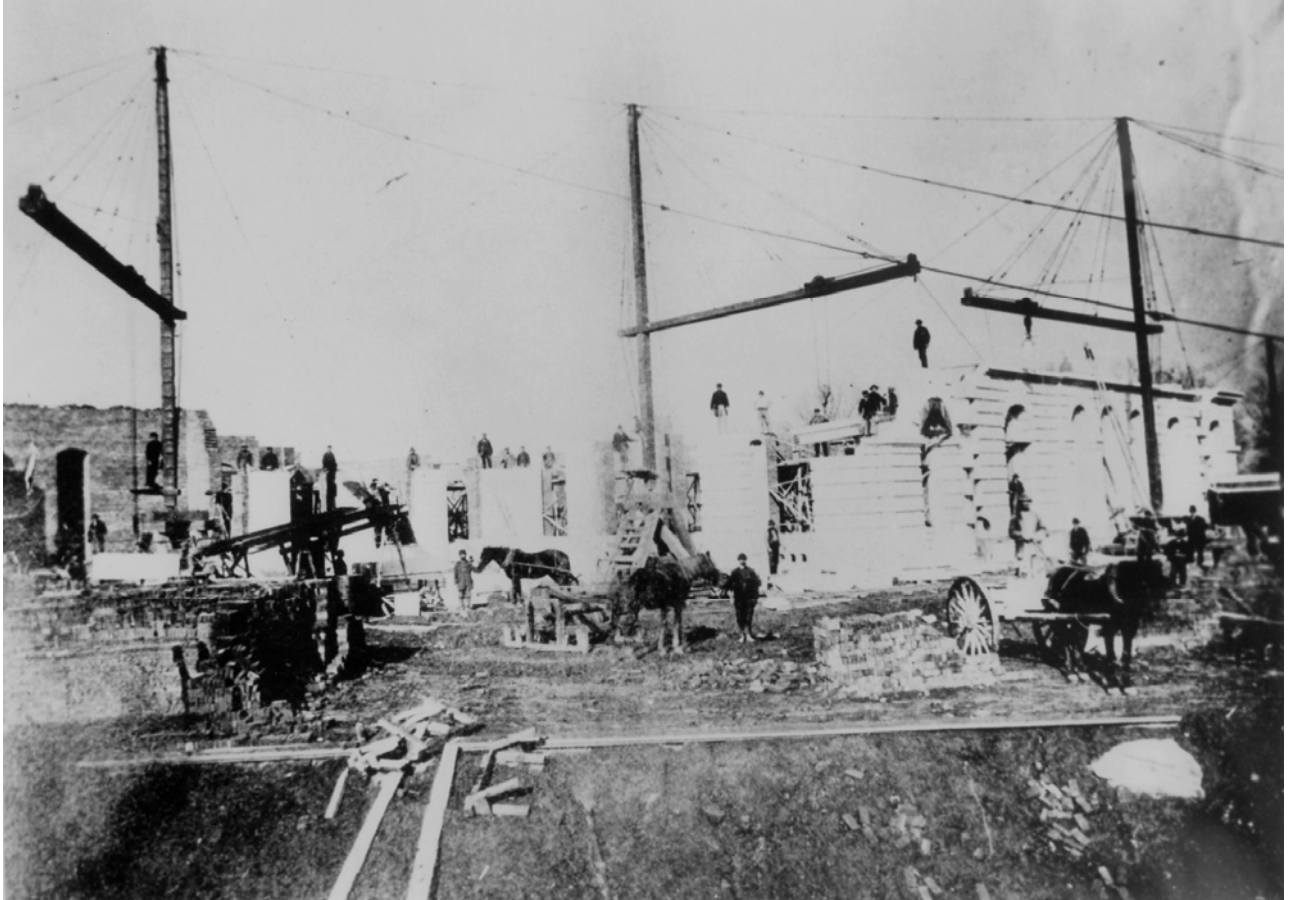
View of the first floor walls rising from the ground, in a photograph taken in 1870 or 1871. The stone was furnished by Sanger and Steel of Joliet. In the foreground are the railroad spur and cranes used to unload building materials.
